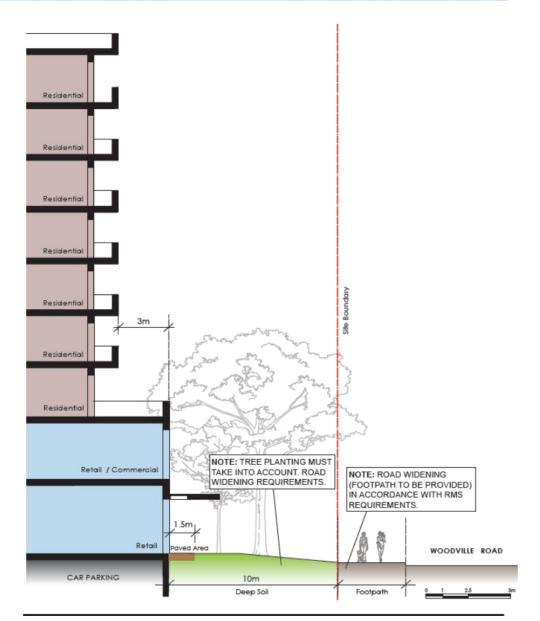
Woodville Road Setbacks (Section B-B)
